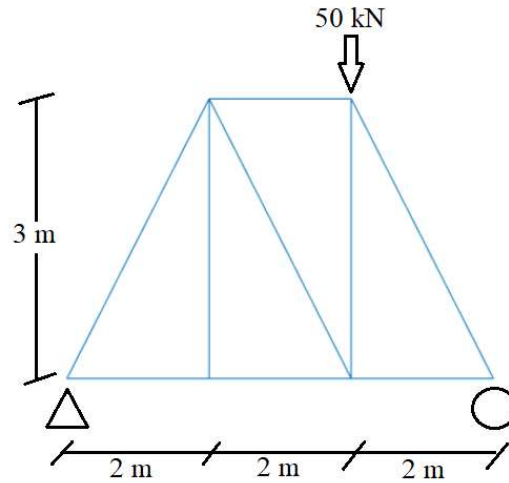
Optimal Truss Structure of Sixteen Elements Truss Subjected to Second Load Case
